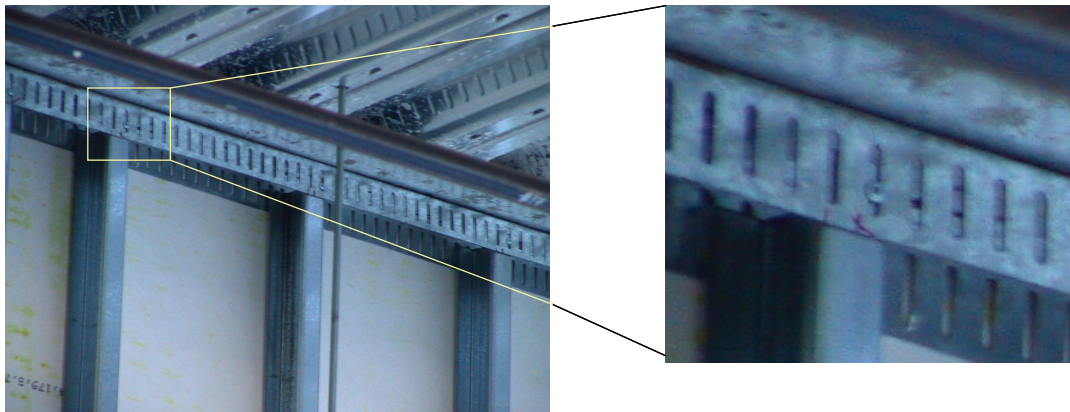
Photo of typical connection between stud and upper track (photo by E. Miranda).
